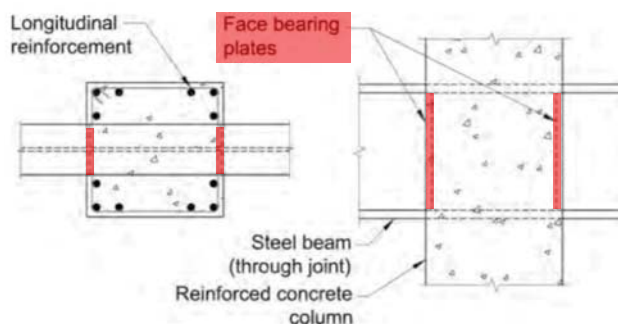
Reinforced concrete column-to-steel beam moment connection.
